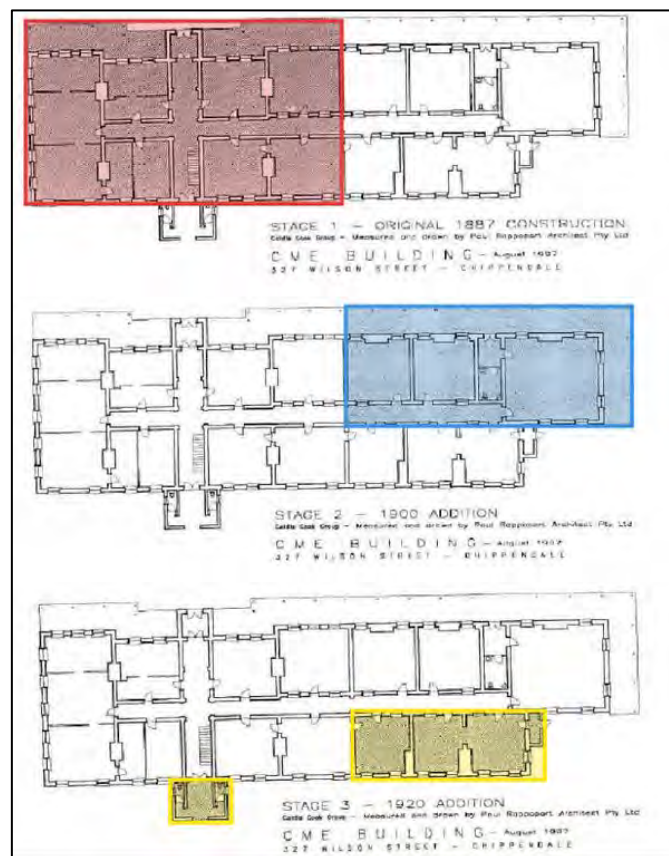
Ground floor plans of the CME building with the three main phases of construction outlined in red, blue and yellow.
